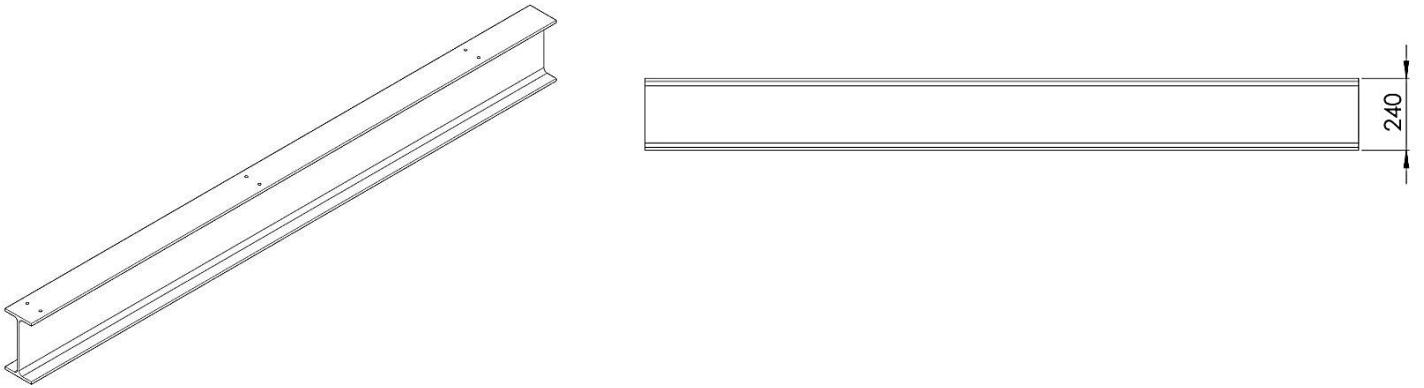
Profiled Ground Support and Walkway Fittings
